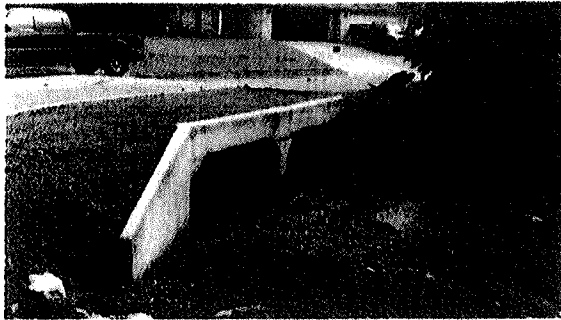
Drainage Creek Under Rainsong - Day After Flooding
